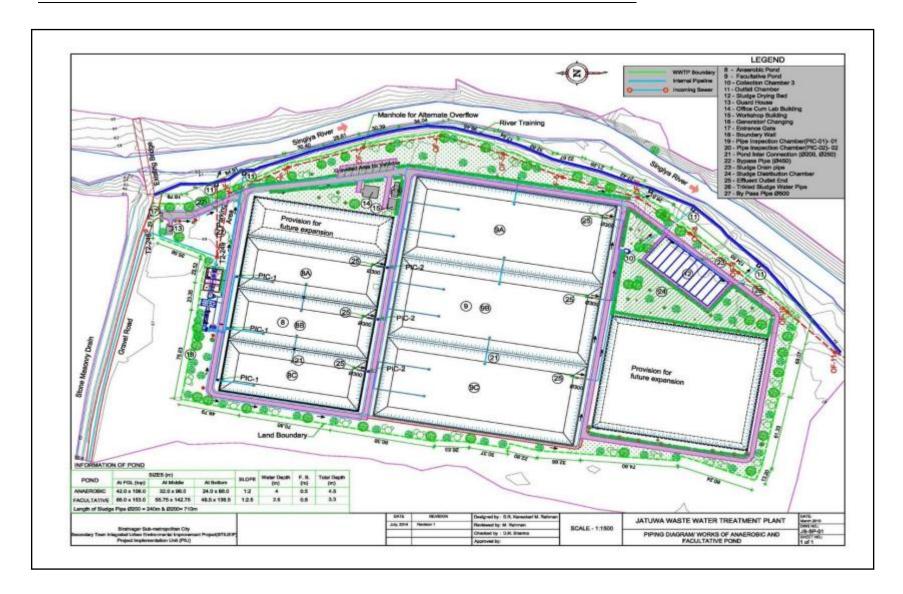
Proposed Waste Water Treatment Plant at Jatuwa in BSMC
